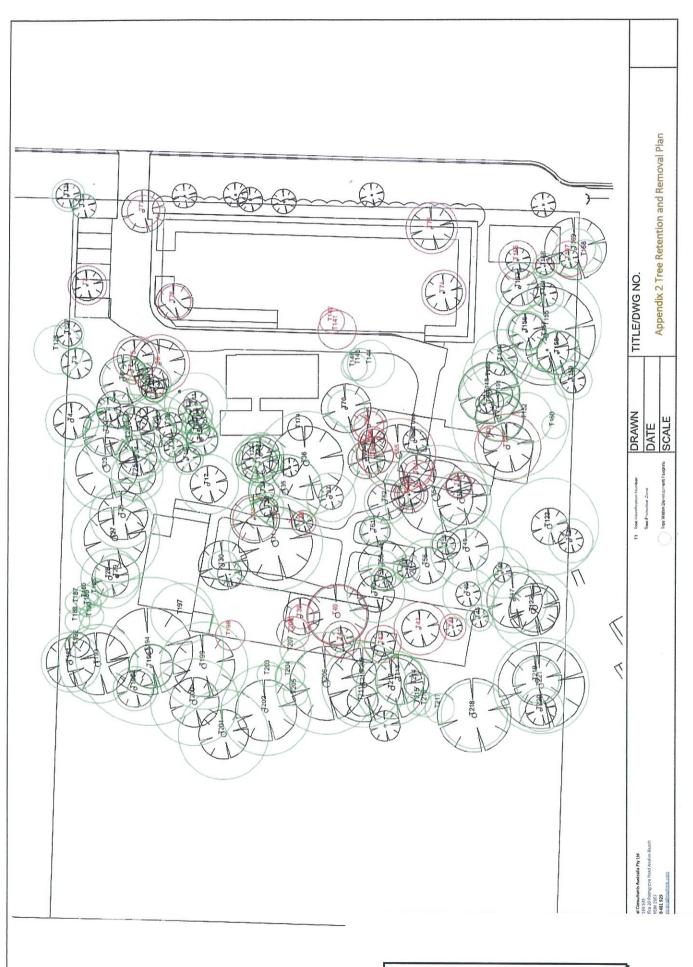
Tree Retention and Removal Plan (Source- Appendix 2 Arboricultural Impact Assessment Statement)
